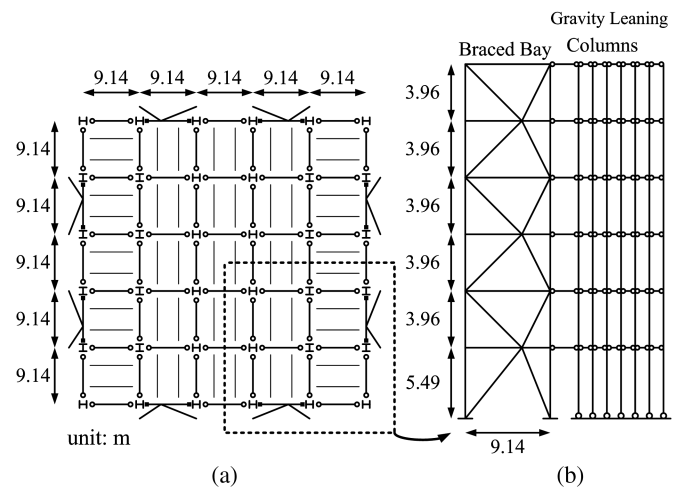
Model building: (a) plan view; (b) 2D frame model elevation
